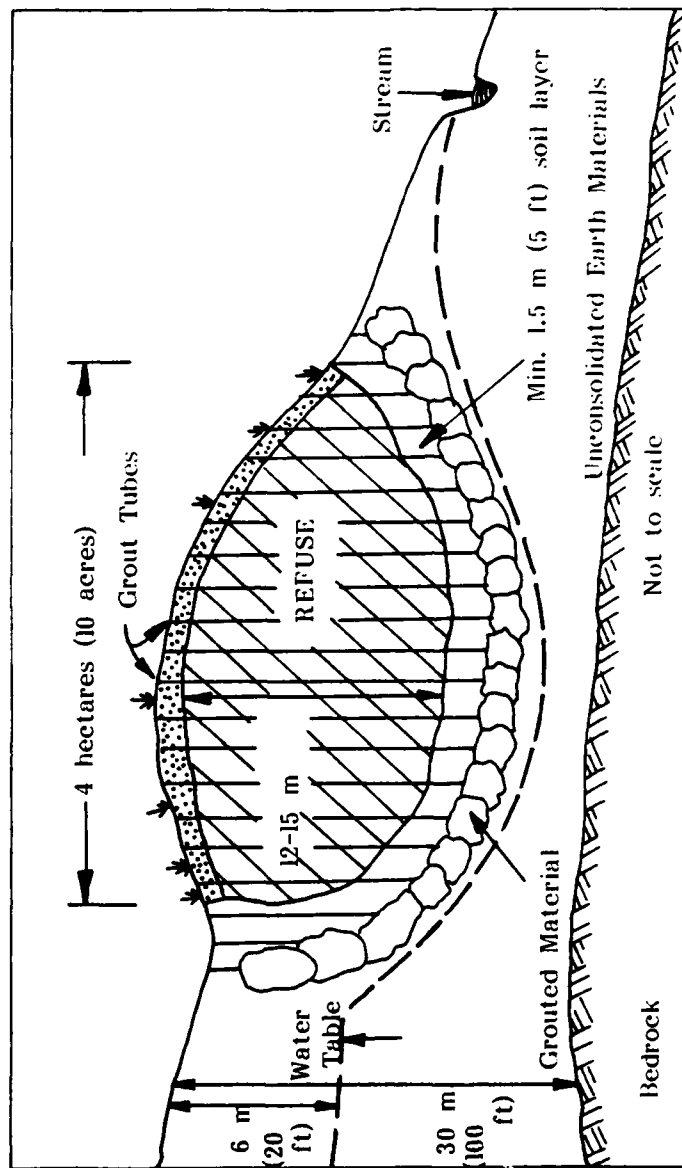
Cross Sectional of Grouted Bottom Seal Beneath a Landfill (Tolman et al., 1978)
